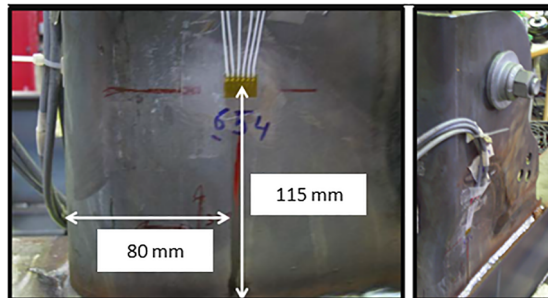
Detail of strain gauge rosette location over curve-shaped support (type A).
